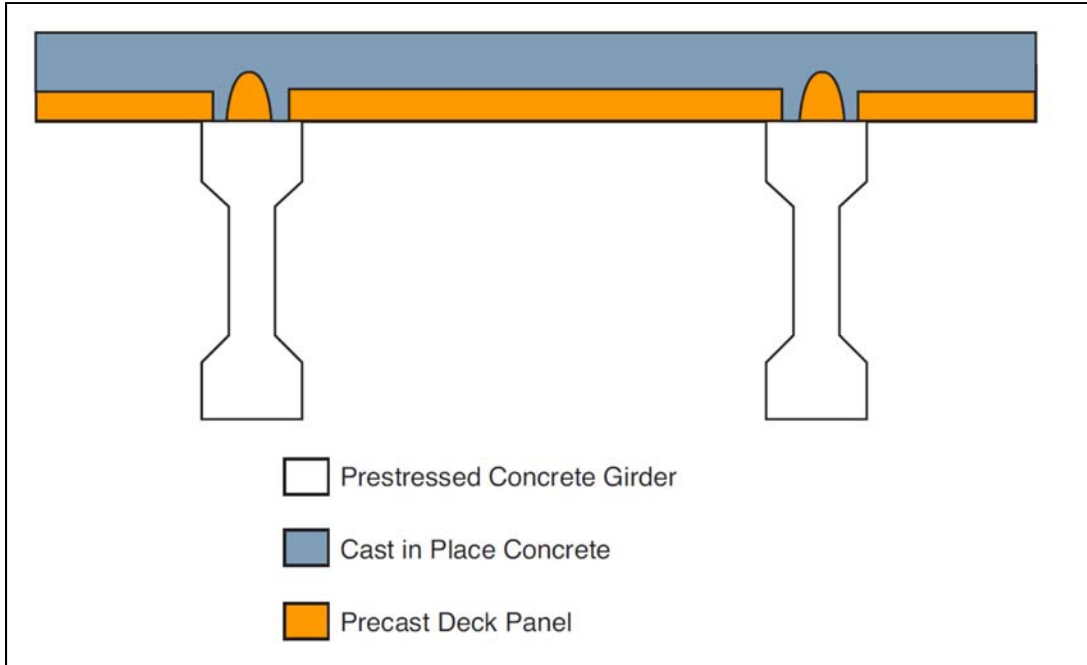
Precast, prestressed concrete panel bridge deck system (Folliard, Smith, Sellers, Brown & Breen, 2003).
